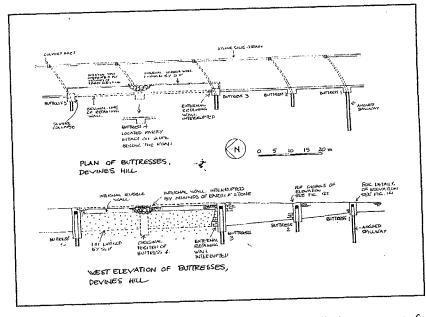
Plan and west elevation of the buttresses, Devine's Hill, showing extent of slip and exposed internal retaining wall.
